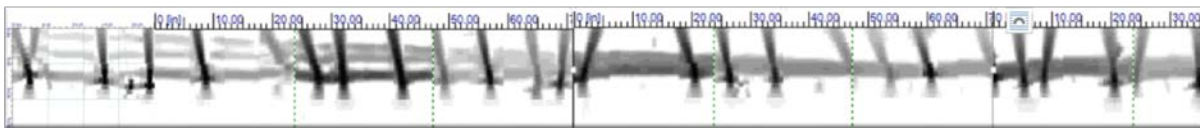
Blockscan of north exterior beam from east abutment to center line (Bridge 7701).
